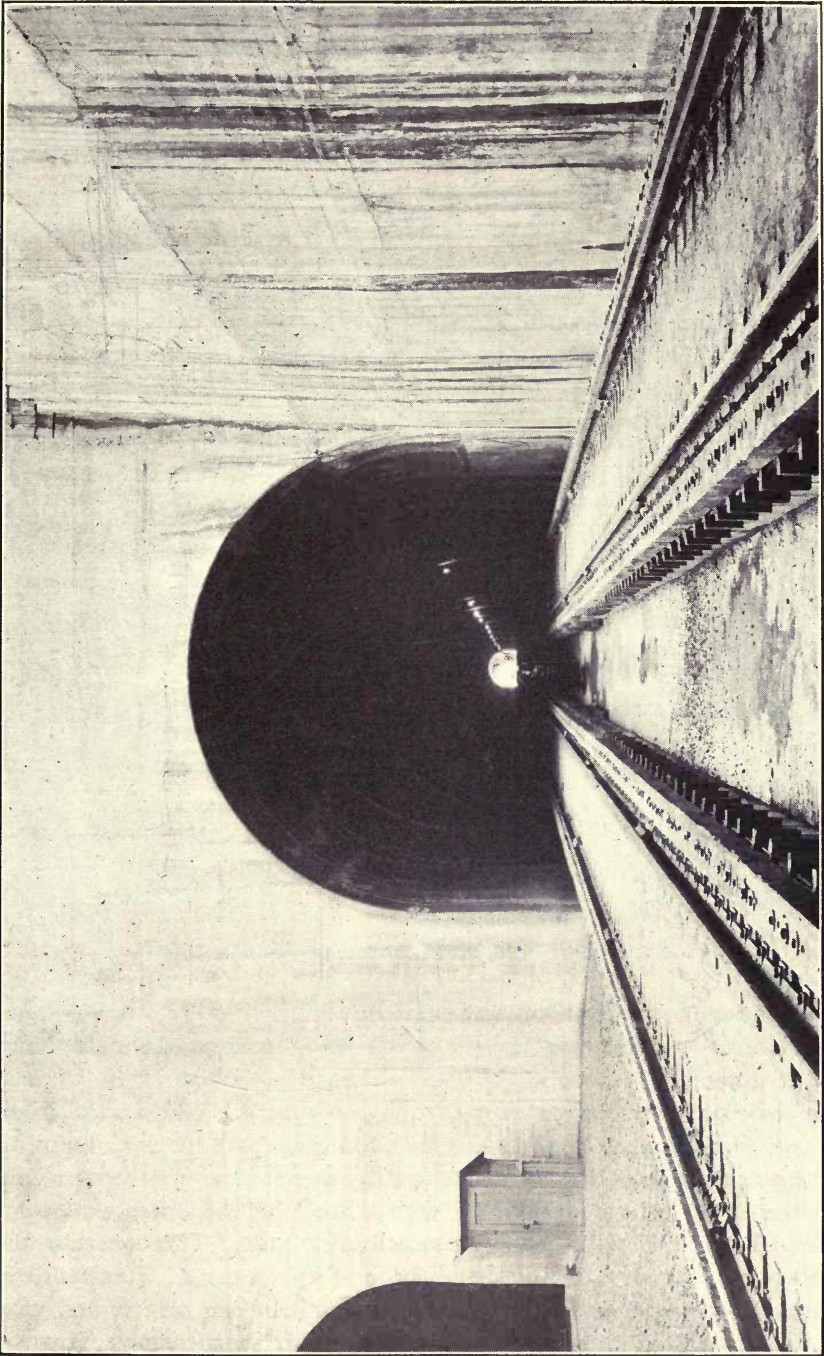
VIEW TAKEN AT ONE OF THE TWO OPEN SHAFTS IN THE INTERIOR OF TUNNEL SHOWING FINISHED ROADBED.
